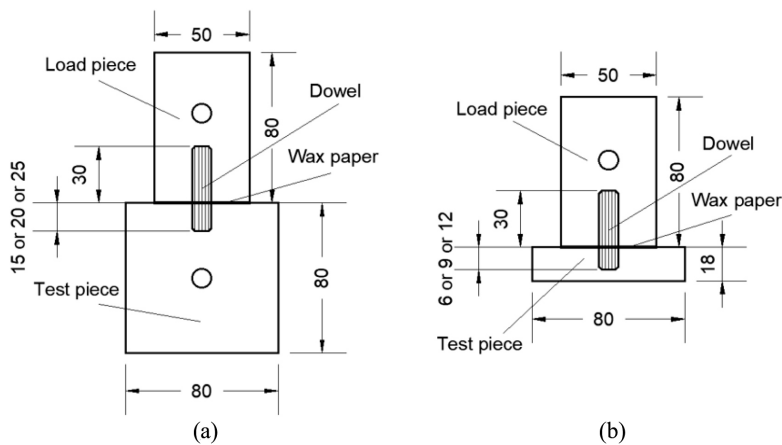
(a) Configuration and sizes (in mm) of edge and (b) face withdrawal test specimens.
